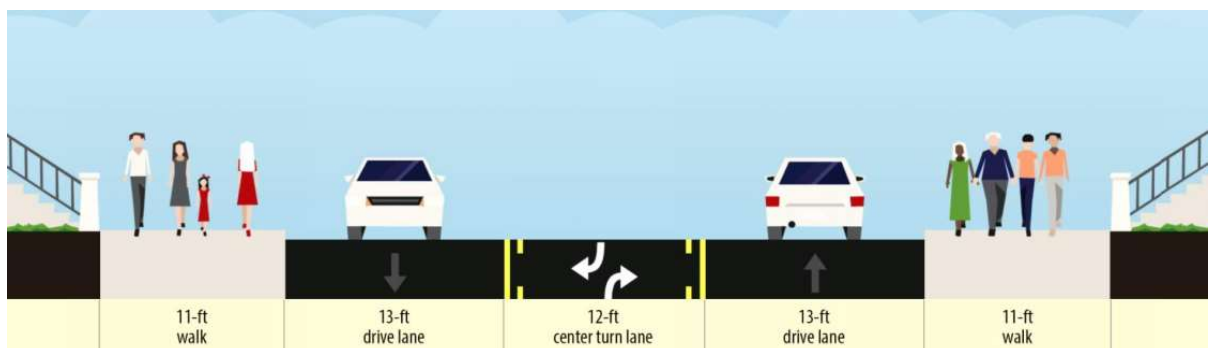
Recommended Typical Section (Riverfront to Broad)
